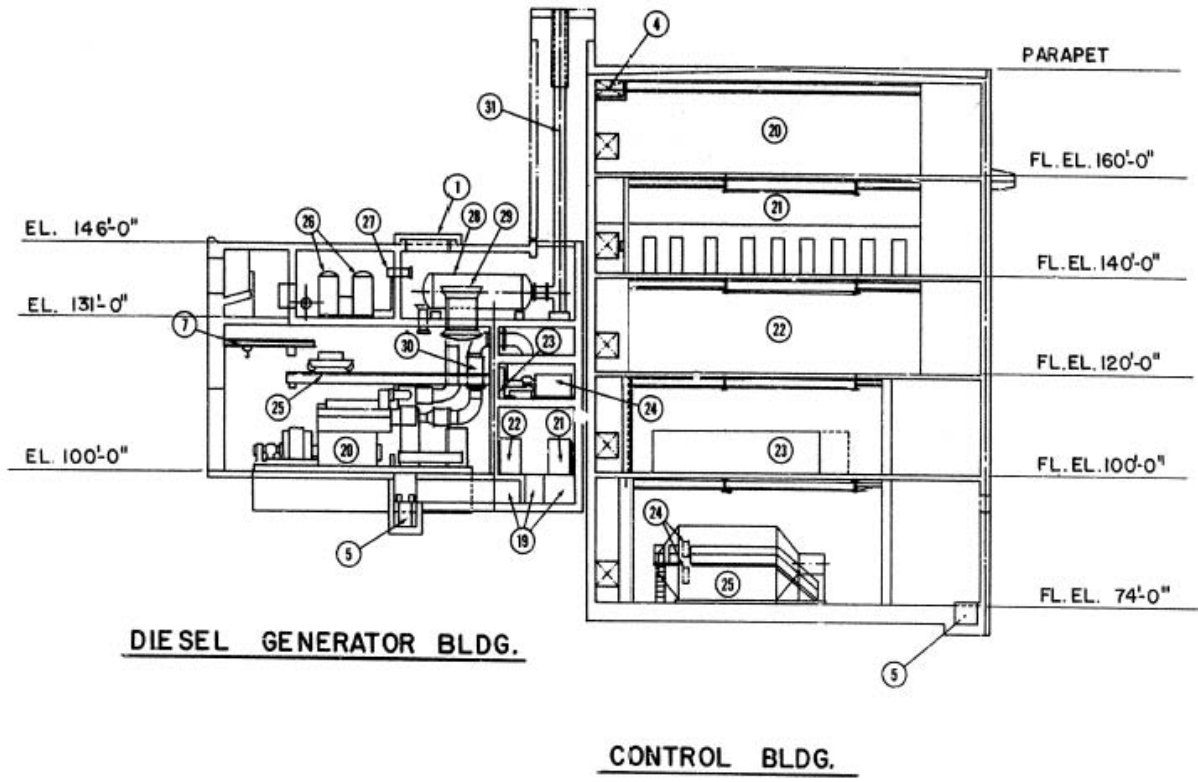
Section drawing of Palo Verde Diesel Generator Room.
